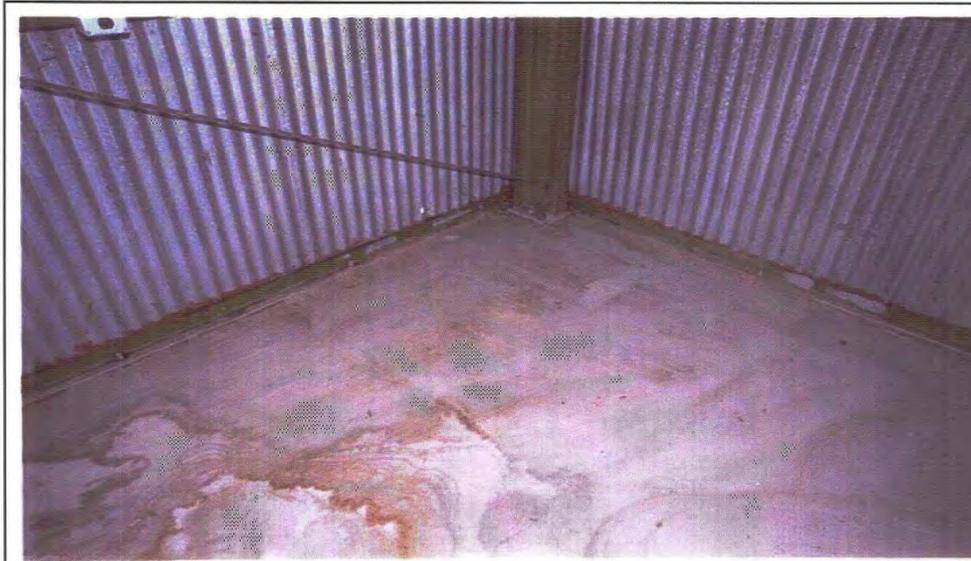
(Above): Patched concrete area (approximately 4 ft x 4 ft) on North-Eastern corner of floor in Building T029.
